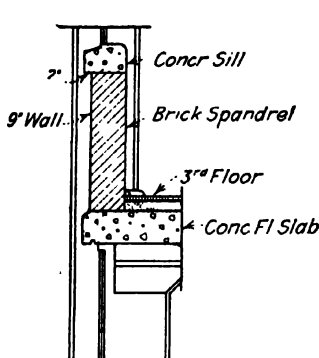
Nine-inch brick spandrel wall—concrete floor slab and column exposed.
